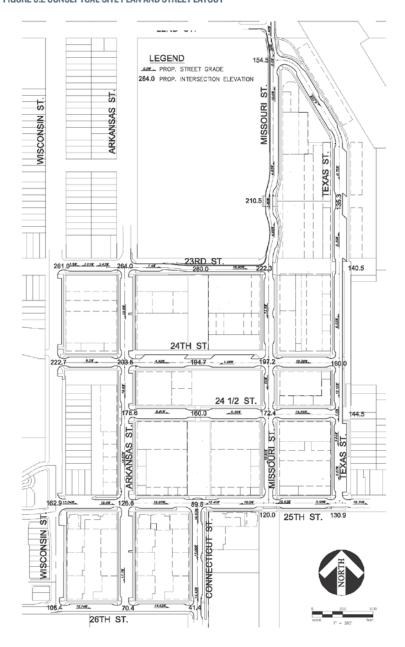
CONCEPTUAL SITE PLAN AND STREET LAYOUT
